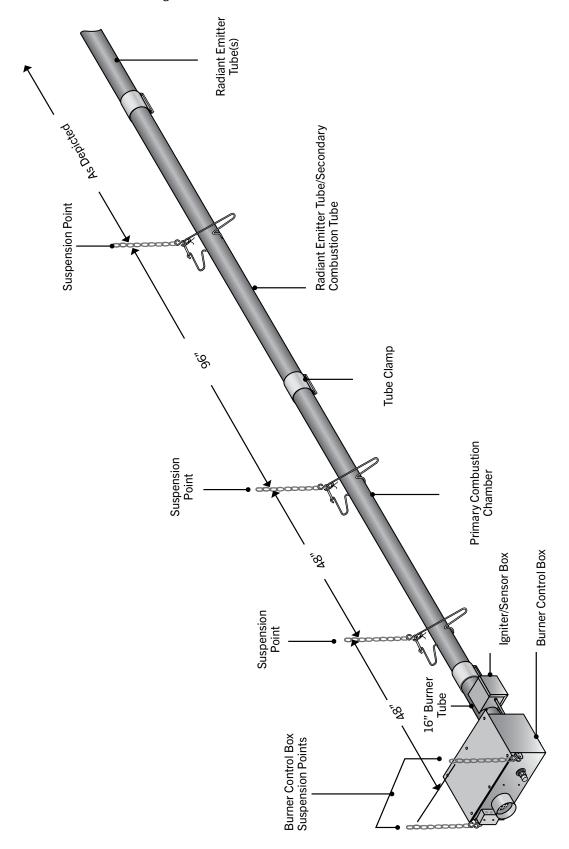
• Heater Suspension Layout • Four (4) Foot Truss Mounts
